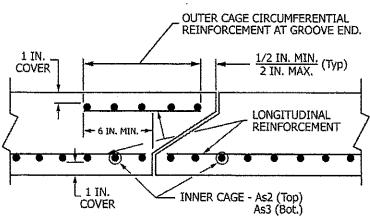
Section A-A Top and Bottom Slab Joint Reinforcement
